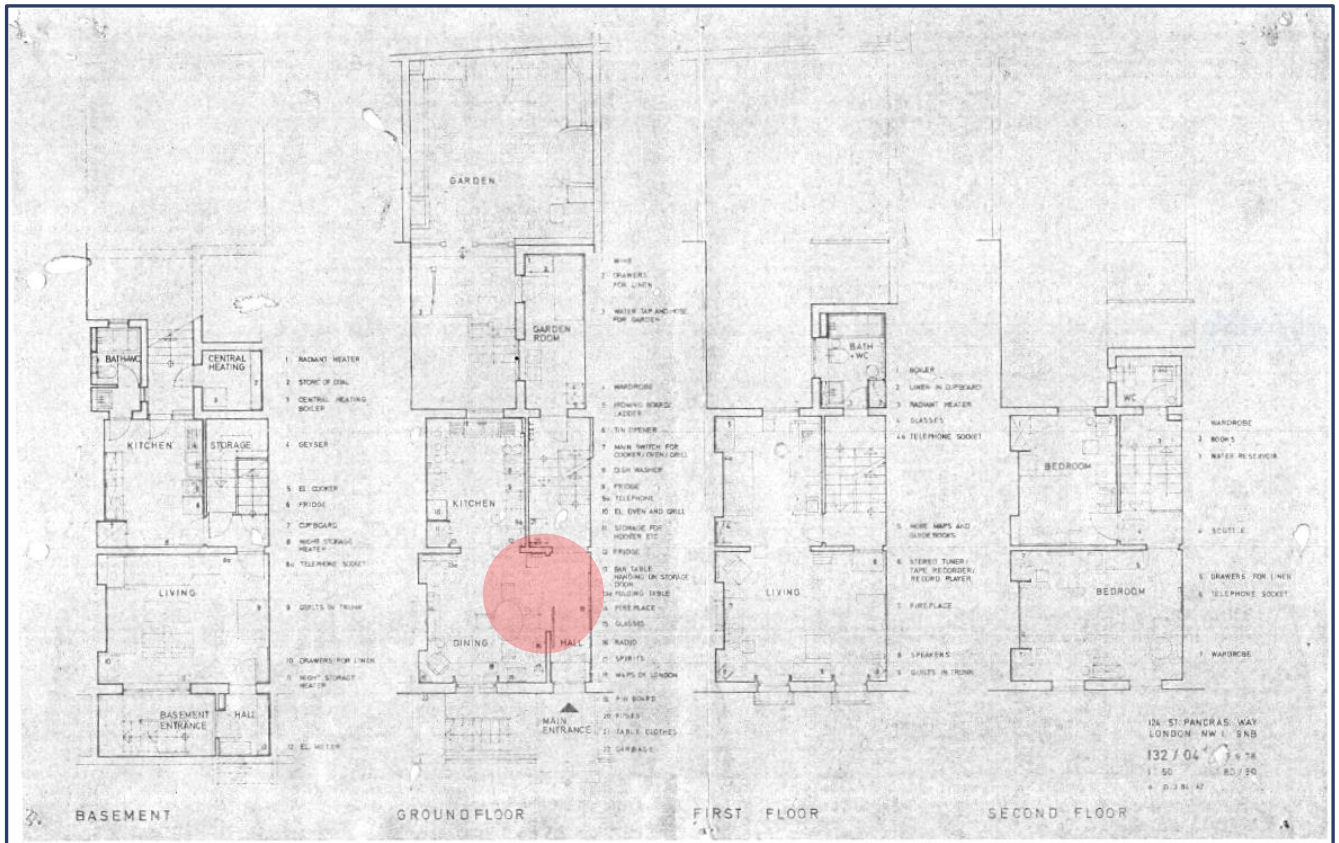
1978 Proposed Architectural Floor Plans of No. 124 St Pancras Way. Source: PDA Planning and Development Associates. Opening indicated by red circle.
